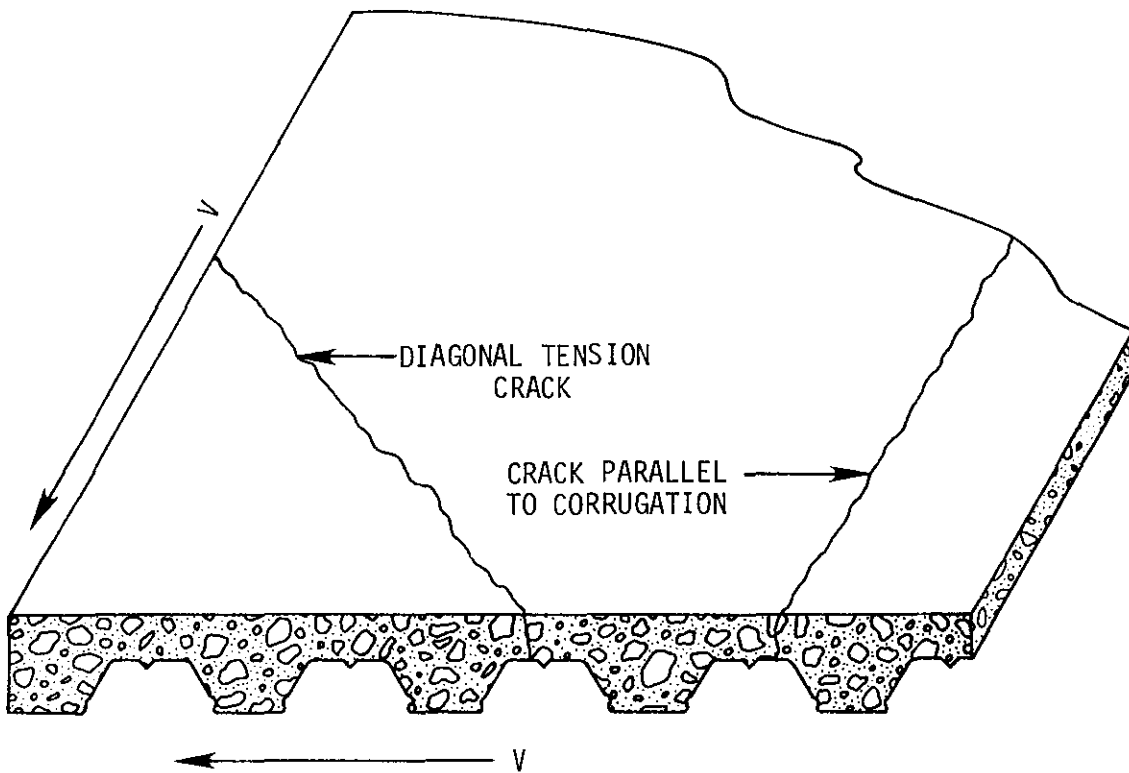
Failure by shearing of the concrete in a) diagonal tension and b) cracks parallel to the corrugations (Failure Mode 1a-1 and 1a-2 in Table 1).
